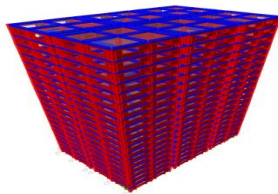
3 D View of the RC Framed Masonry infill structure 20 % opening
